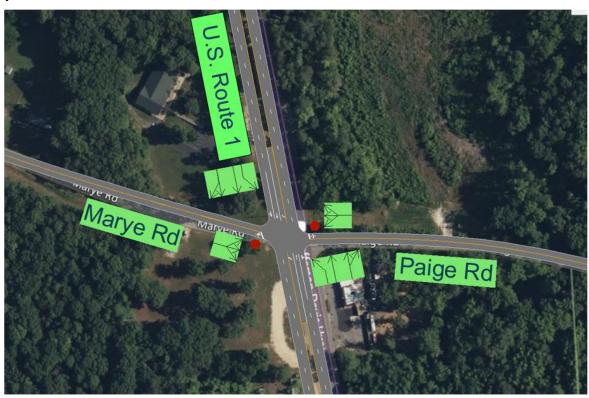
U.S. Route 1 at Marye Road/Paige Road Improvements
